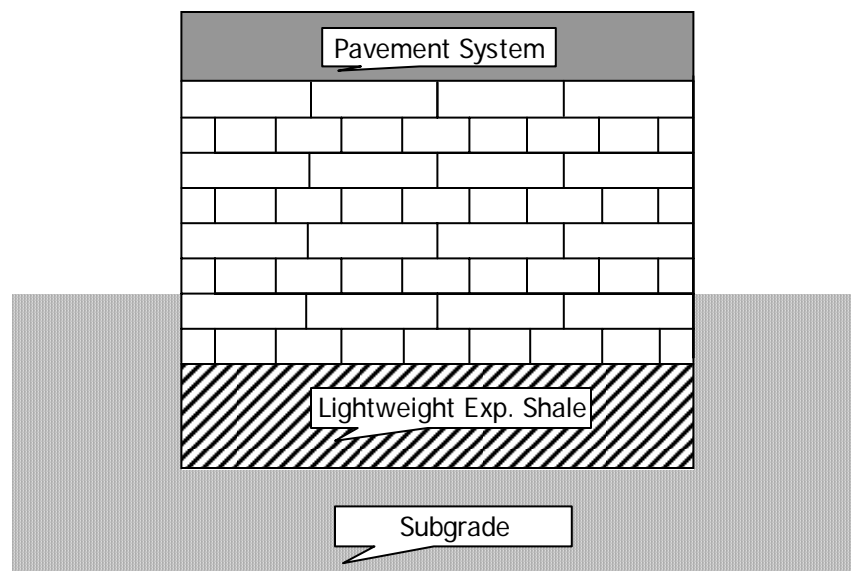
Schematic Cross-Section of a Typical CA/T EPS Embankment Structure
